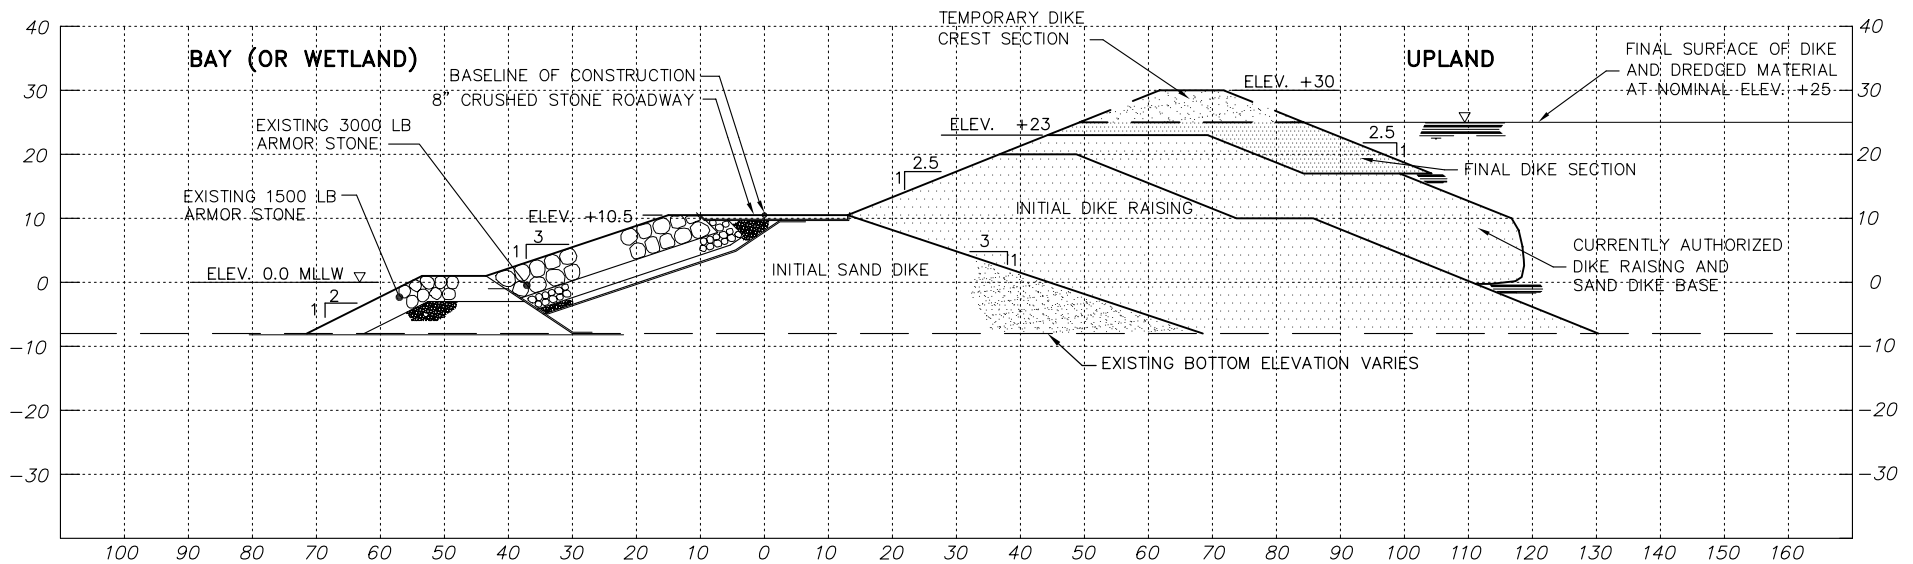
Layout of Typical Section for 5-ft. Dike Raising
